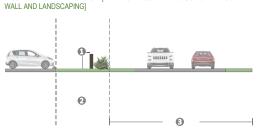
ALTERNATIVE #2 [HEADLIGHT SCREENING USING A MASONRY
